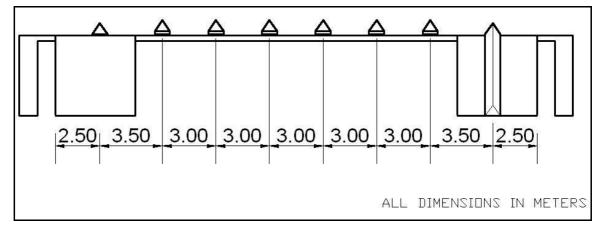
Front View Crossing Junction Switch Dimensions
